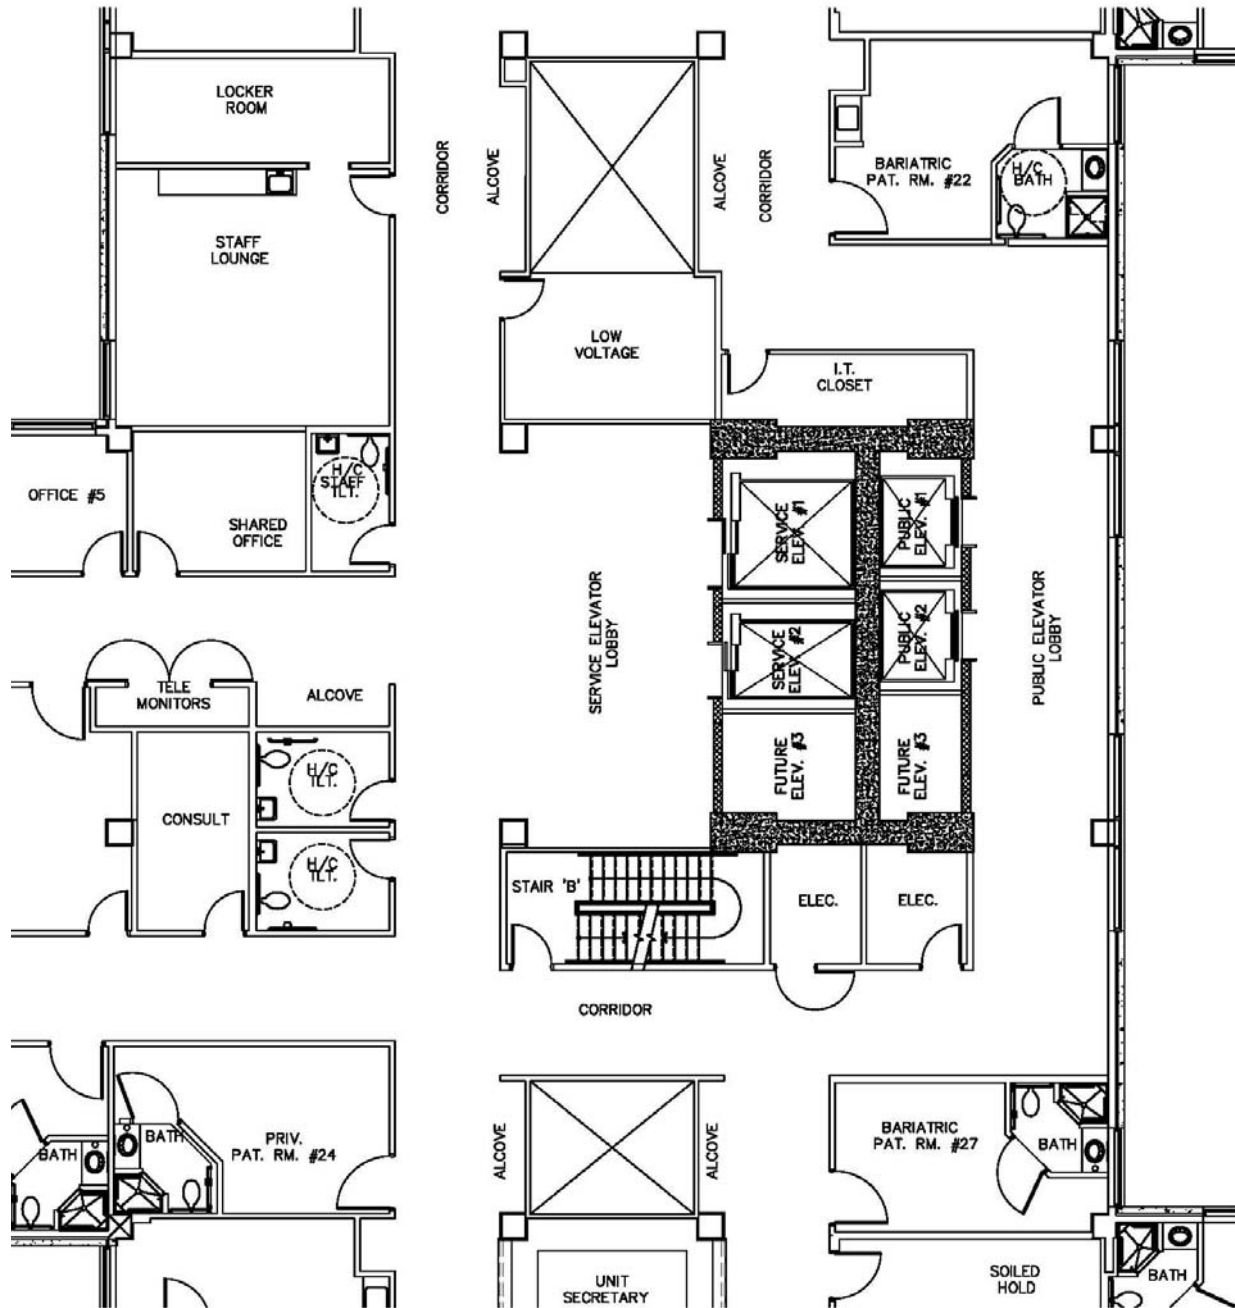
Blow-Up of Central Section of Shear Wall Lateral System Plan Design
